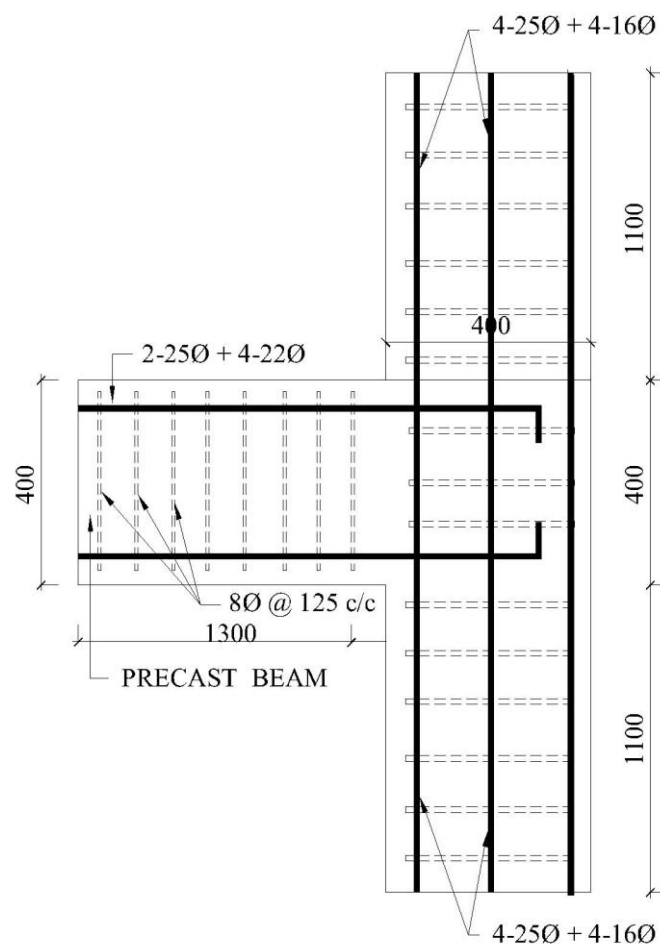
Side elevation of precast specimen P.C.-3
